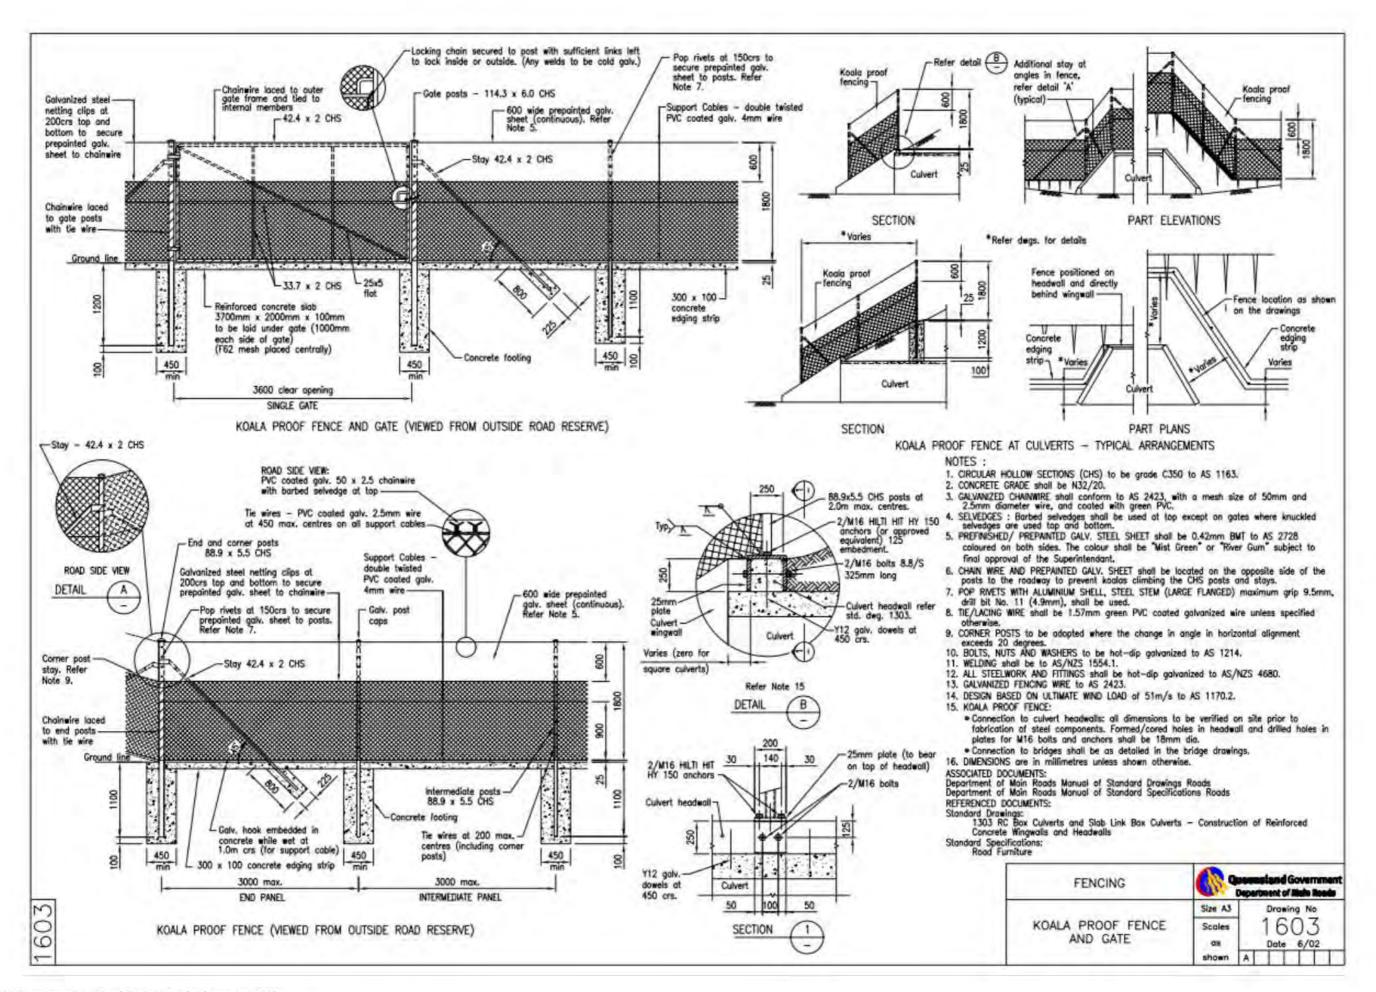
TMR Fauna Sensitive Road Design Standard Drawing 1603
